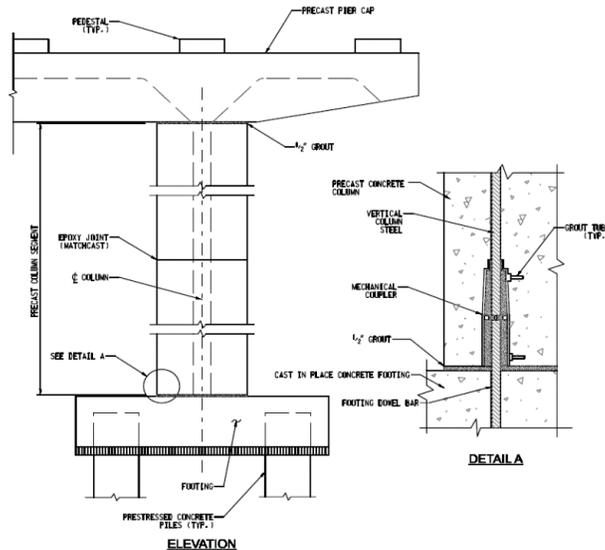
56 Cast-in-place footing to precast column connection using mechanical couplers [8].
